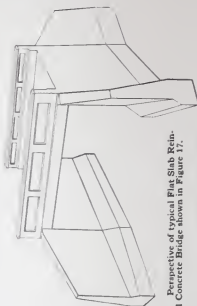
Perspective of typical Flat Slab Reinforced Concrete Bridge shown in Figure 17.
